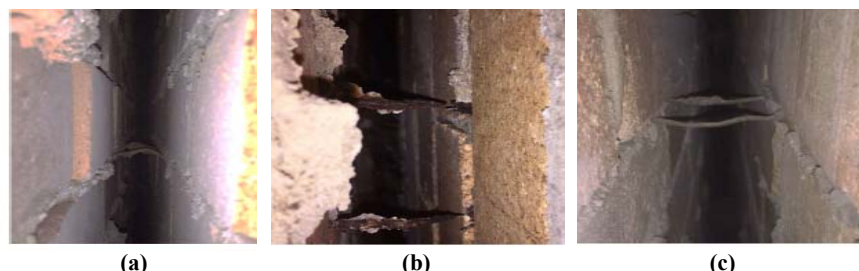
Wall tie inside a cavity wall (Guinane, 2017). The external wall for each image is on the left hand side.
